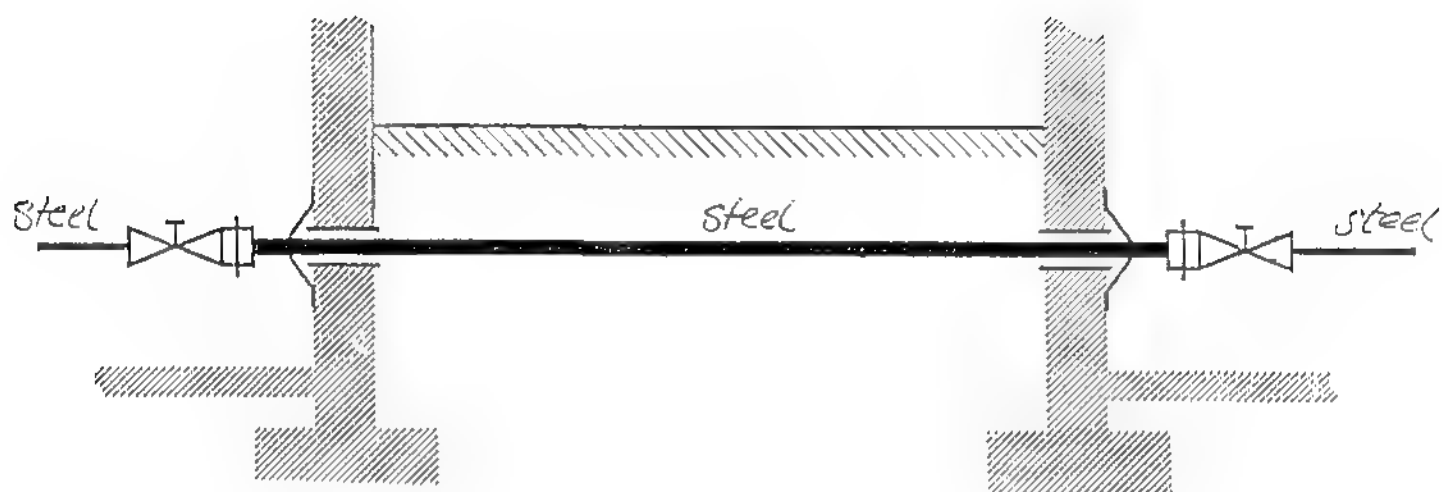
Insulating joint in buried supply pipe - partly laid in pipe channel
